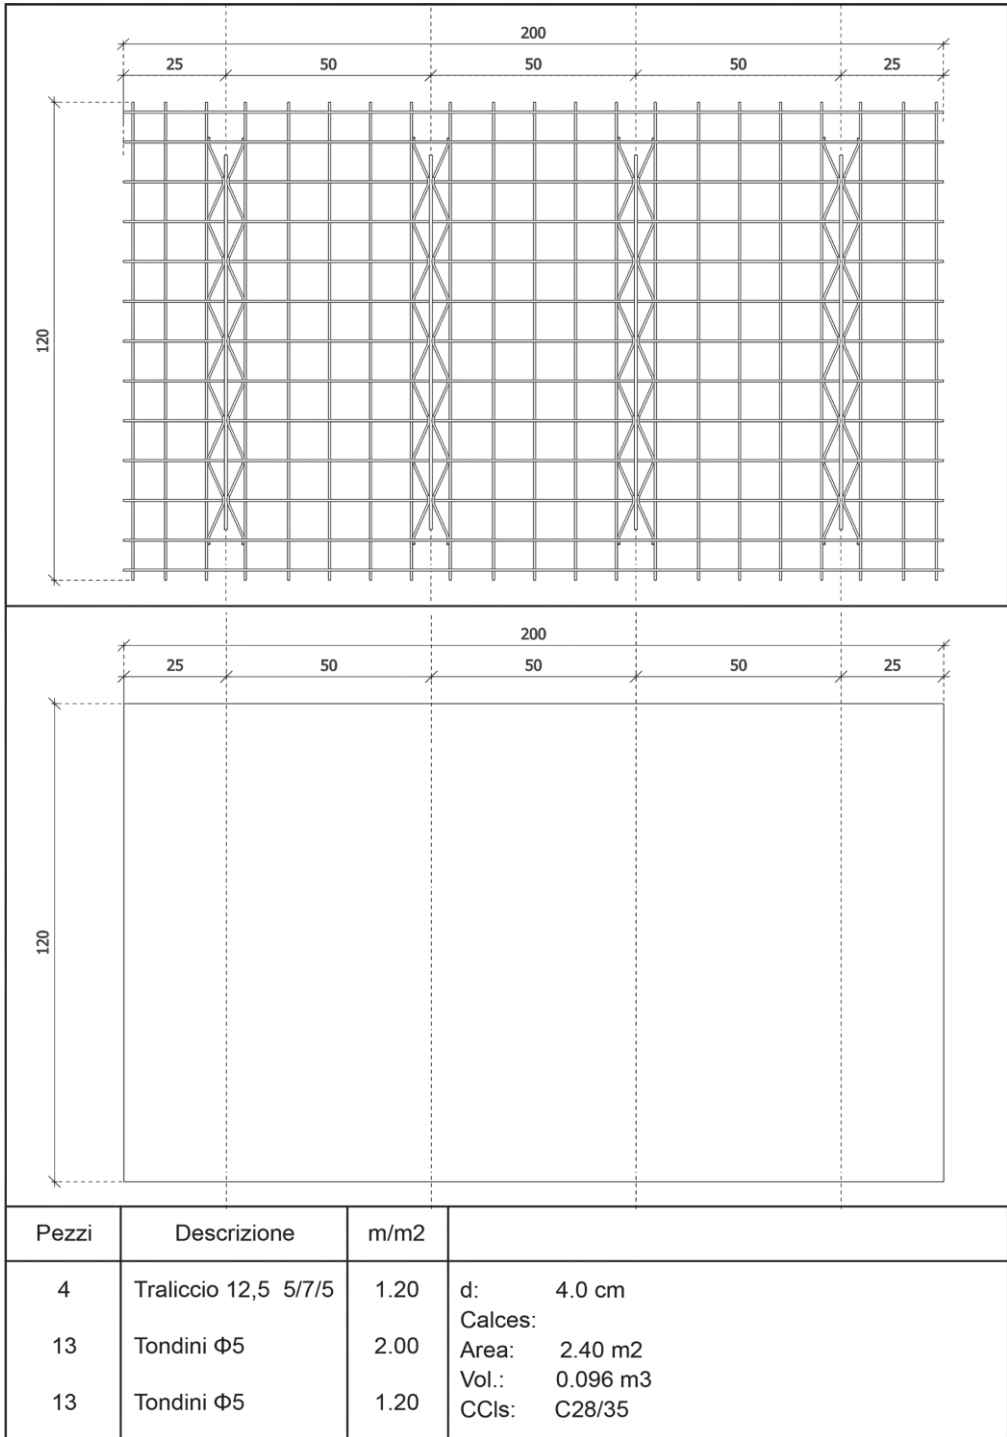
Production sheet for the A assembly. Source: Author
